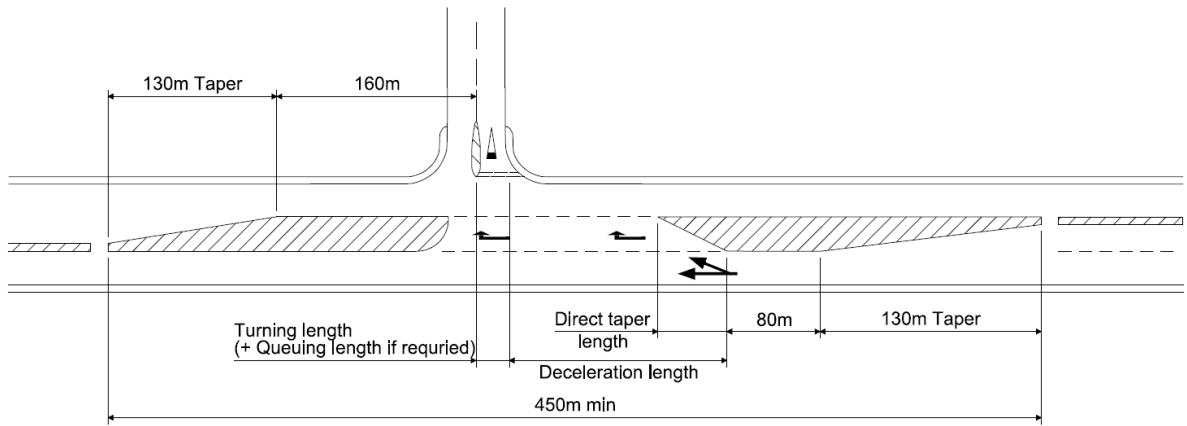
Formation of non-conflicting central treatment layout on WS2+1 road
